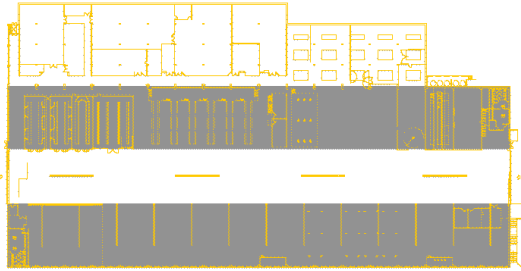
Floor plan of Nave 1. Roof area is shown in grey.
